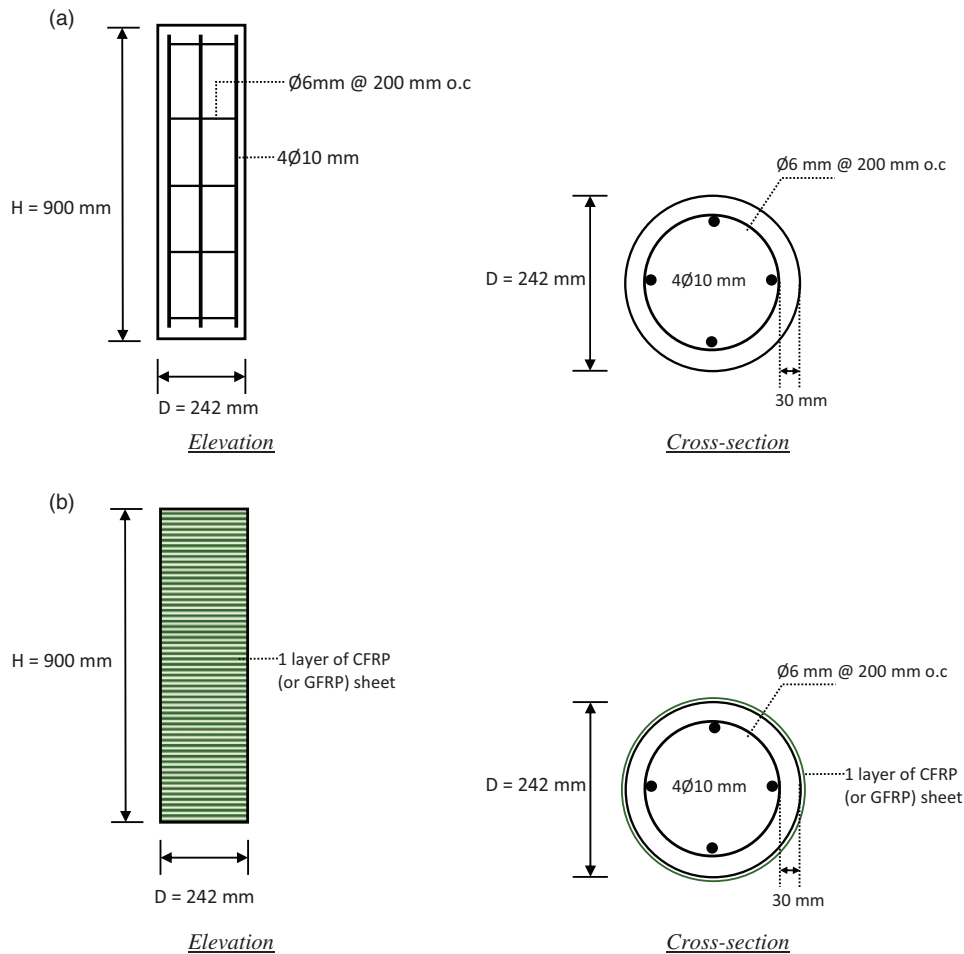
Details of test specimens. (a) Unstrengthened specimens and (b) FRP-strengthened specimens.
